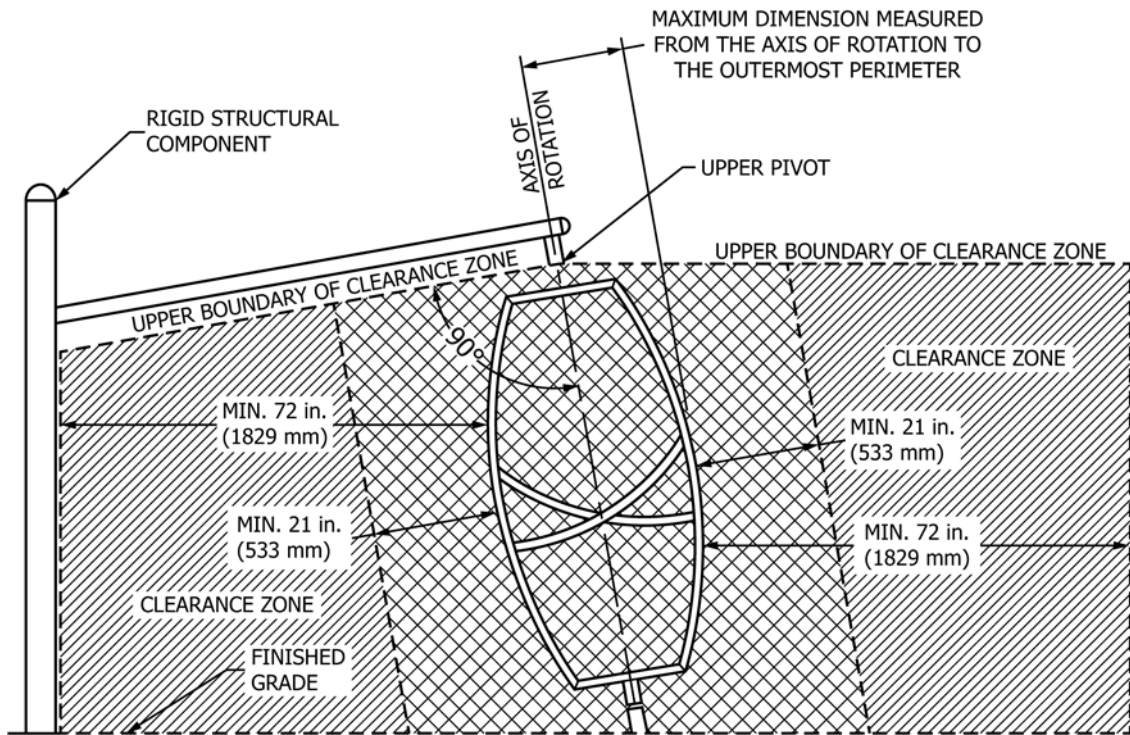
Clearance for Rotating Equipment with a Reducing Plane of Motion
